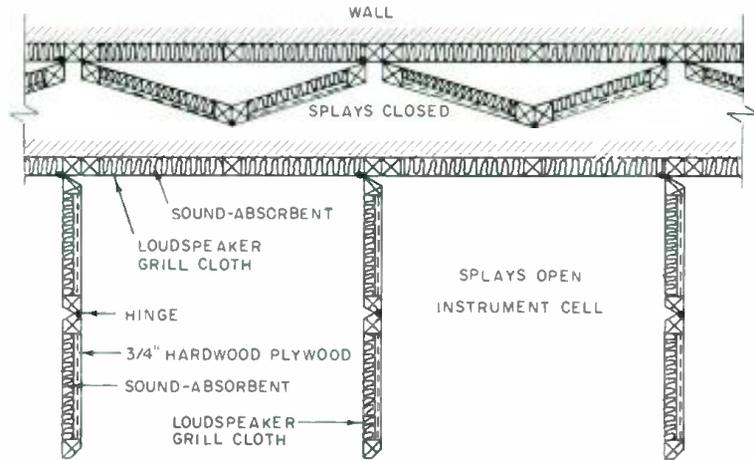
Details of construction of the folding wall panels shown in Fig. 1.
